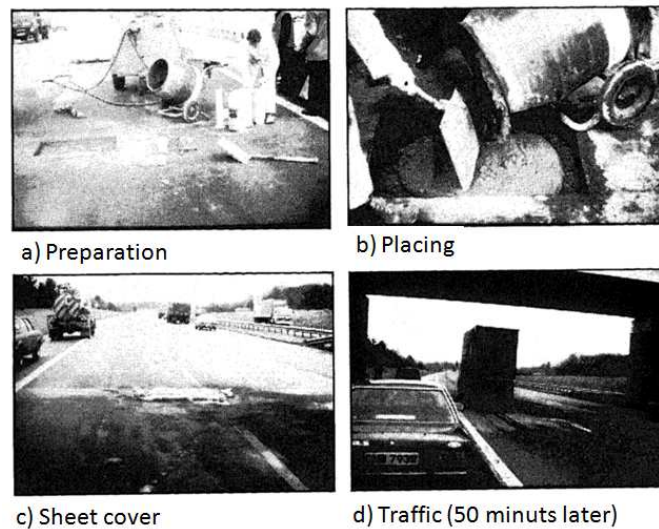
Thin bonded repair at joint of a motorway, in 1981. The traffic was opened 50 minutes after placing the cement (from [9]).
